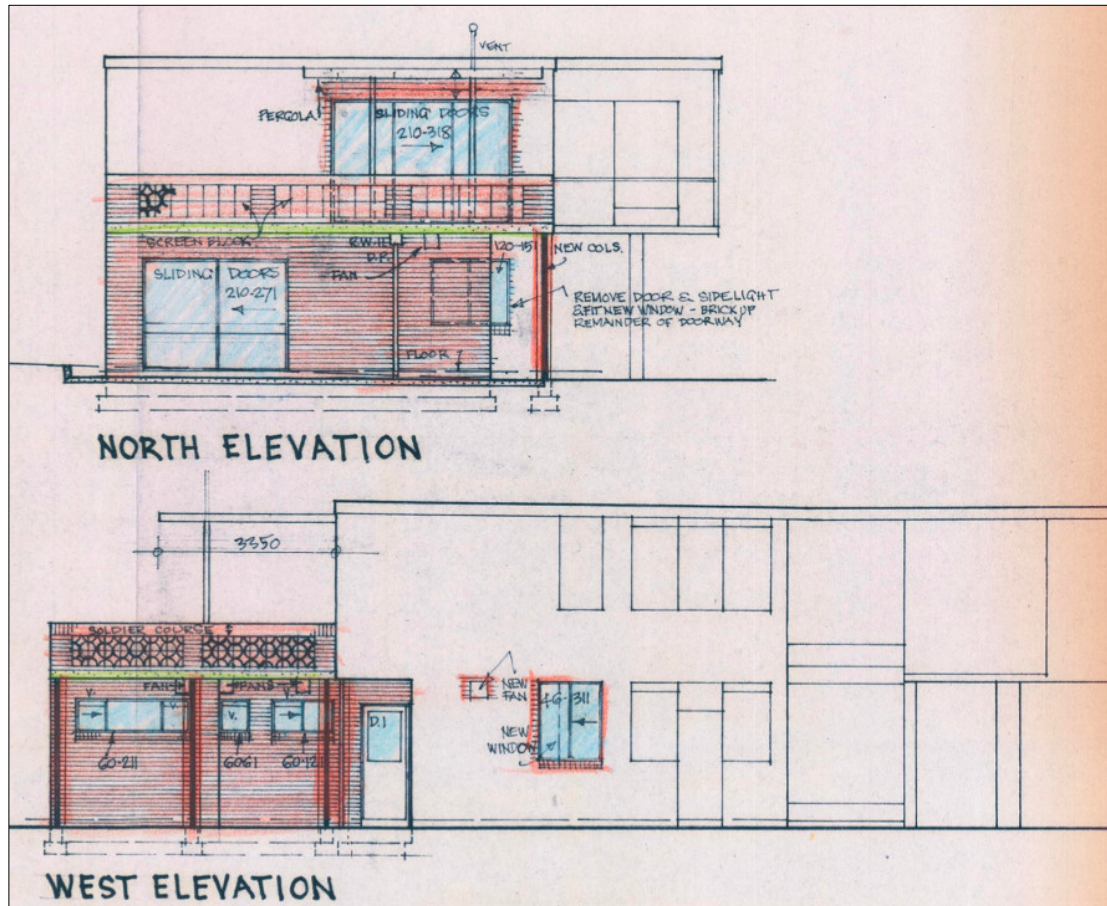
Extract from the 1975 plans showing the north and west elevations of the rear addition. Source: City of Stonnington
